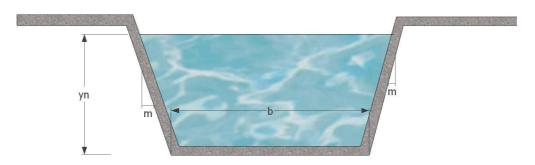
Geometric dimensions of open canal with trapezoidal cross sections
